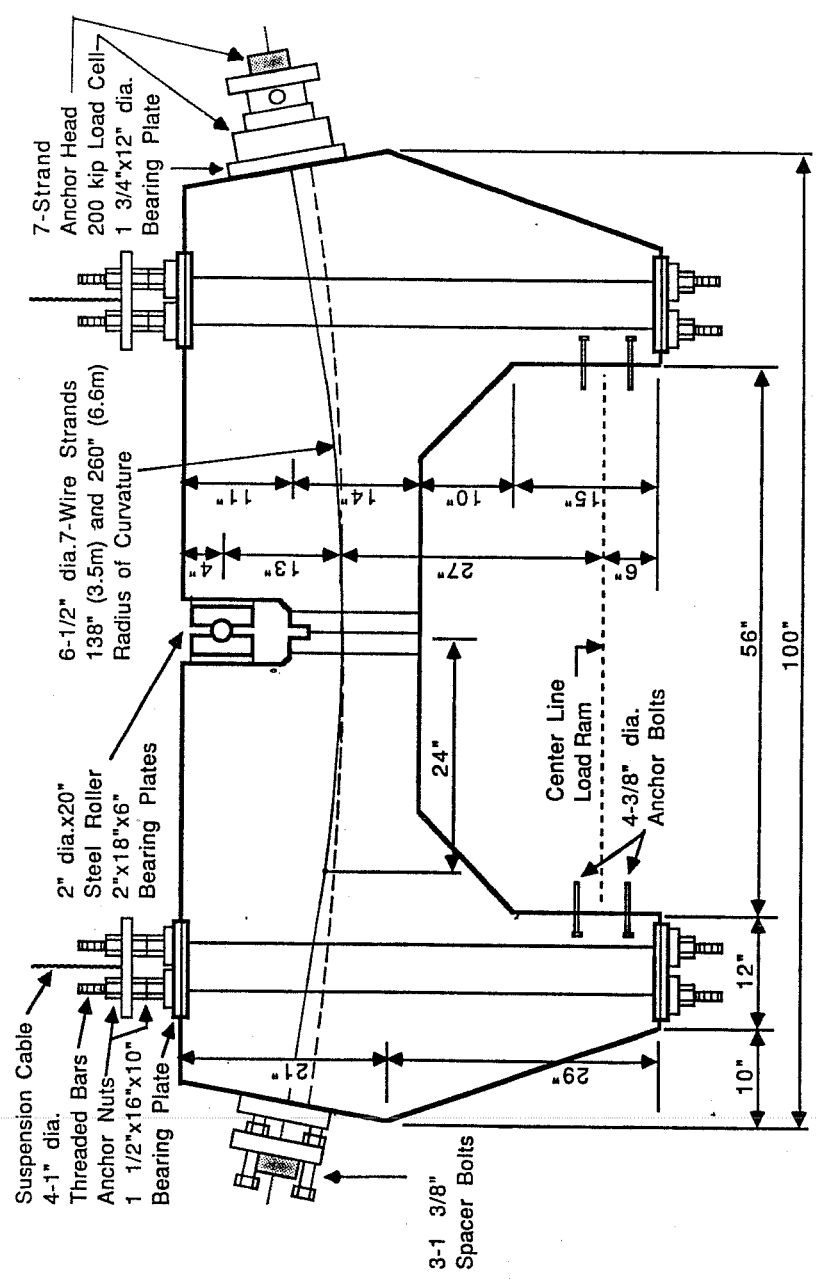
Dimensions and details of multiple strand reduced beam specimens [34]
